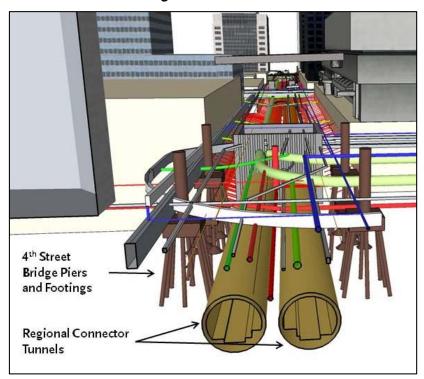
Flower Street Segment: 4th Street Bridge Foundations
